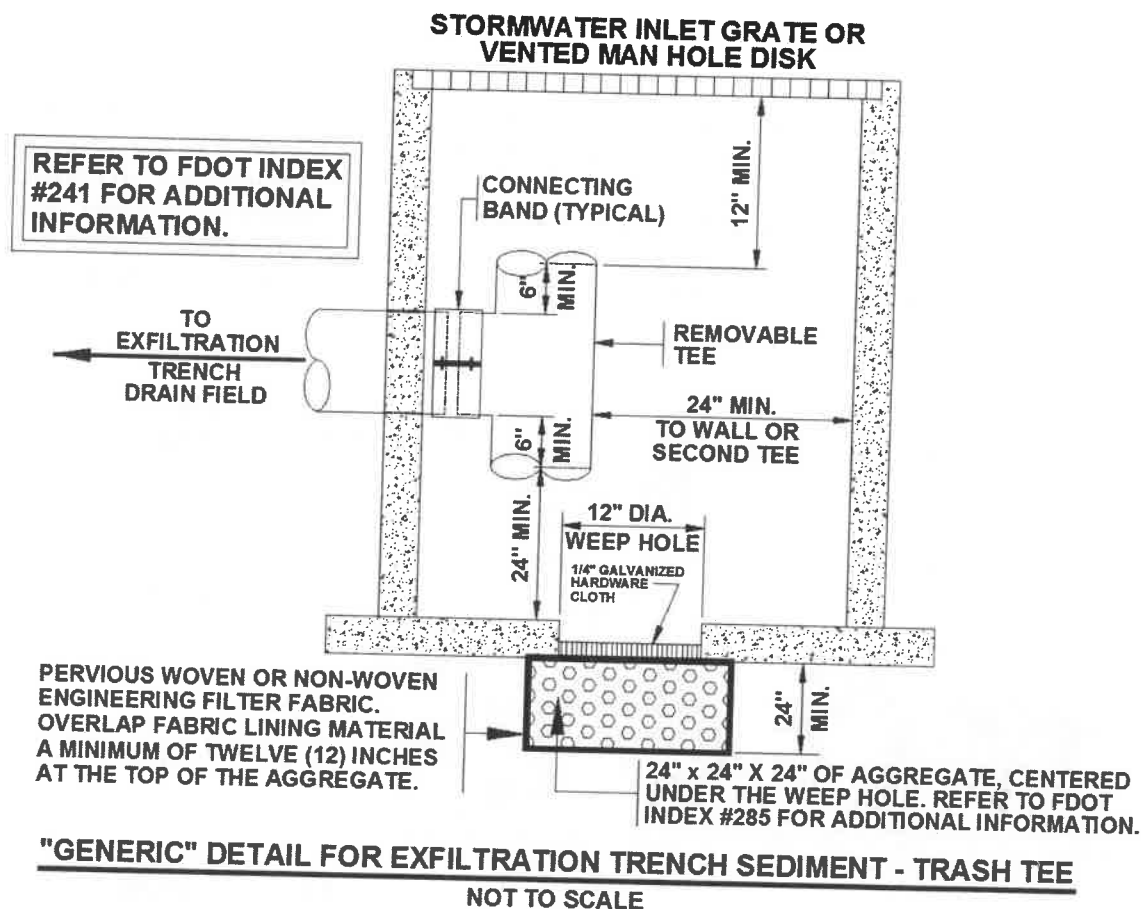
Generic Detail for a Typical Exfiltration Trench Trash Tee
